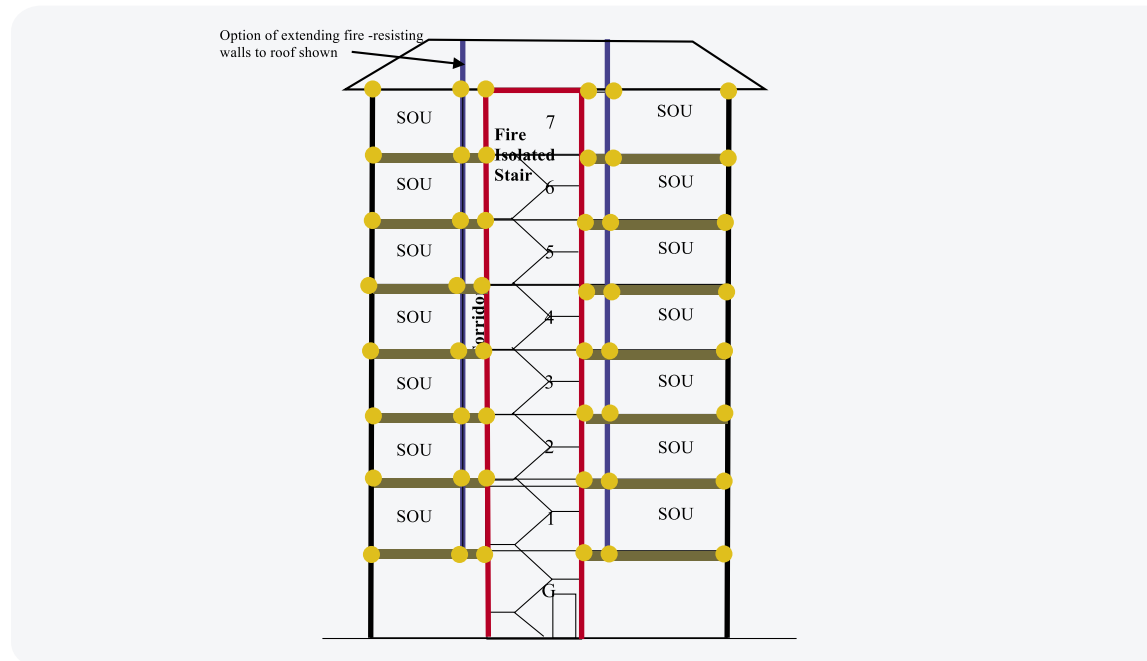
Vertical section of an apartment building showing typical cavity barrier positions.
